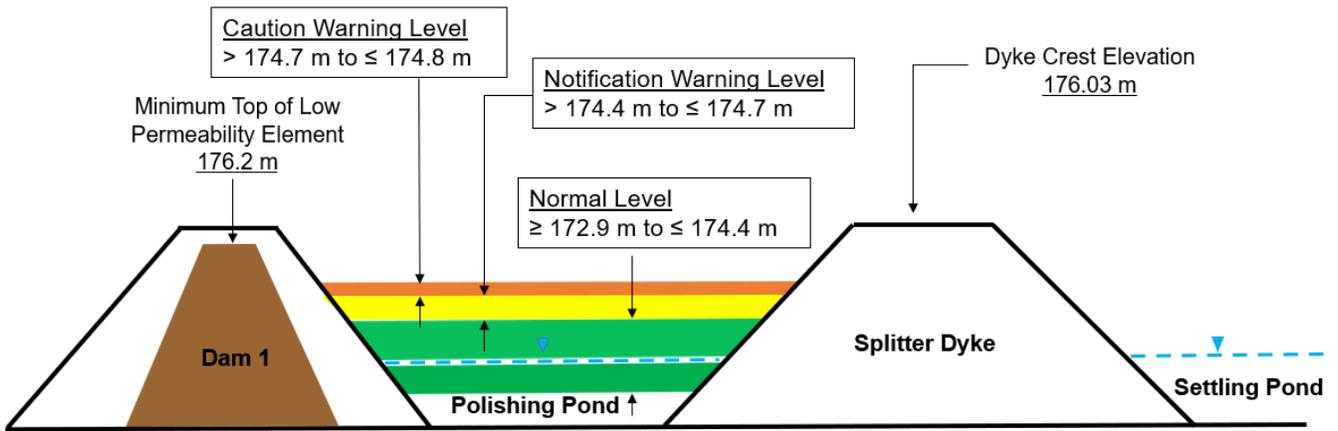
Water and Infrastructure Elevations for Polishing Pond (not to scale)
